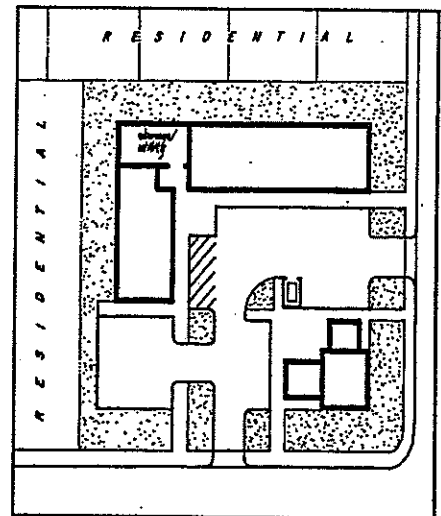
Loading and trash collection located away from residential properties; utilities and storage incorporated into building.
